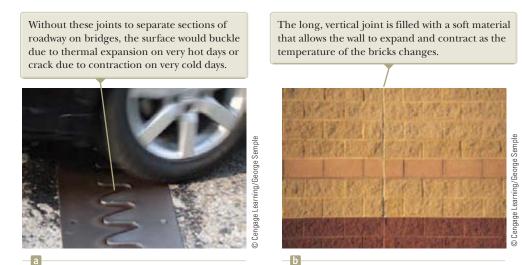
Thermal-expansion joints in (a) bridges and (b) walls.
